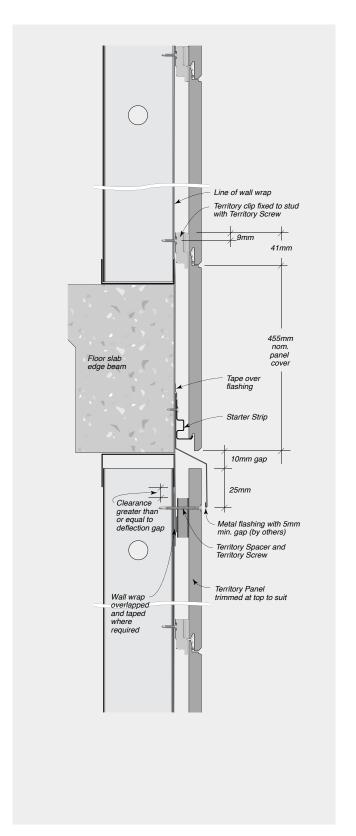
Edge Beam Detail - Horizontal Top Hat
